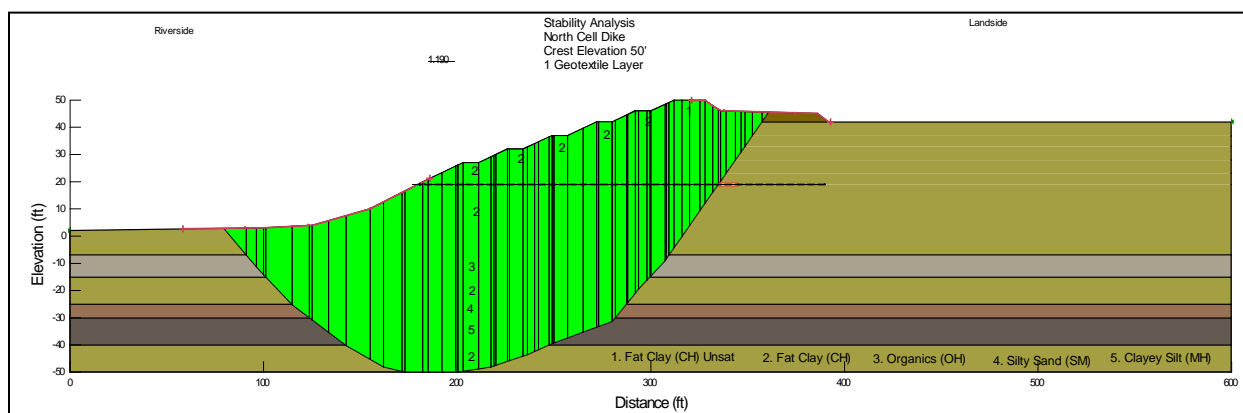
North Cell. Elevation 50'. 1 Geotextile layer. FS = 1.190.
